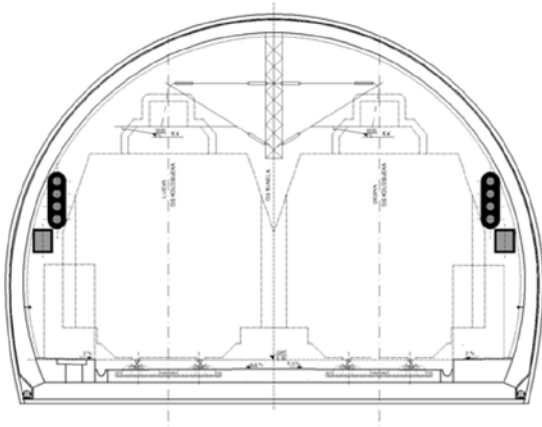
Cross section of a twin tube tunnel with necessary equipment, [4]
